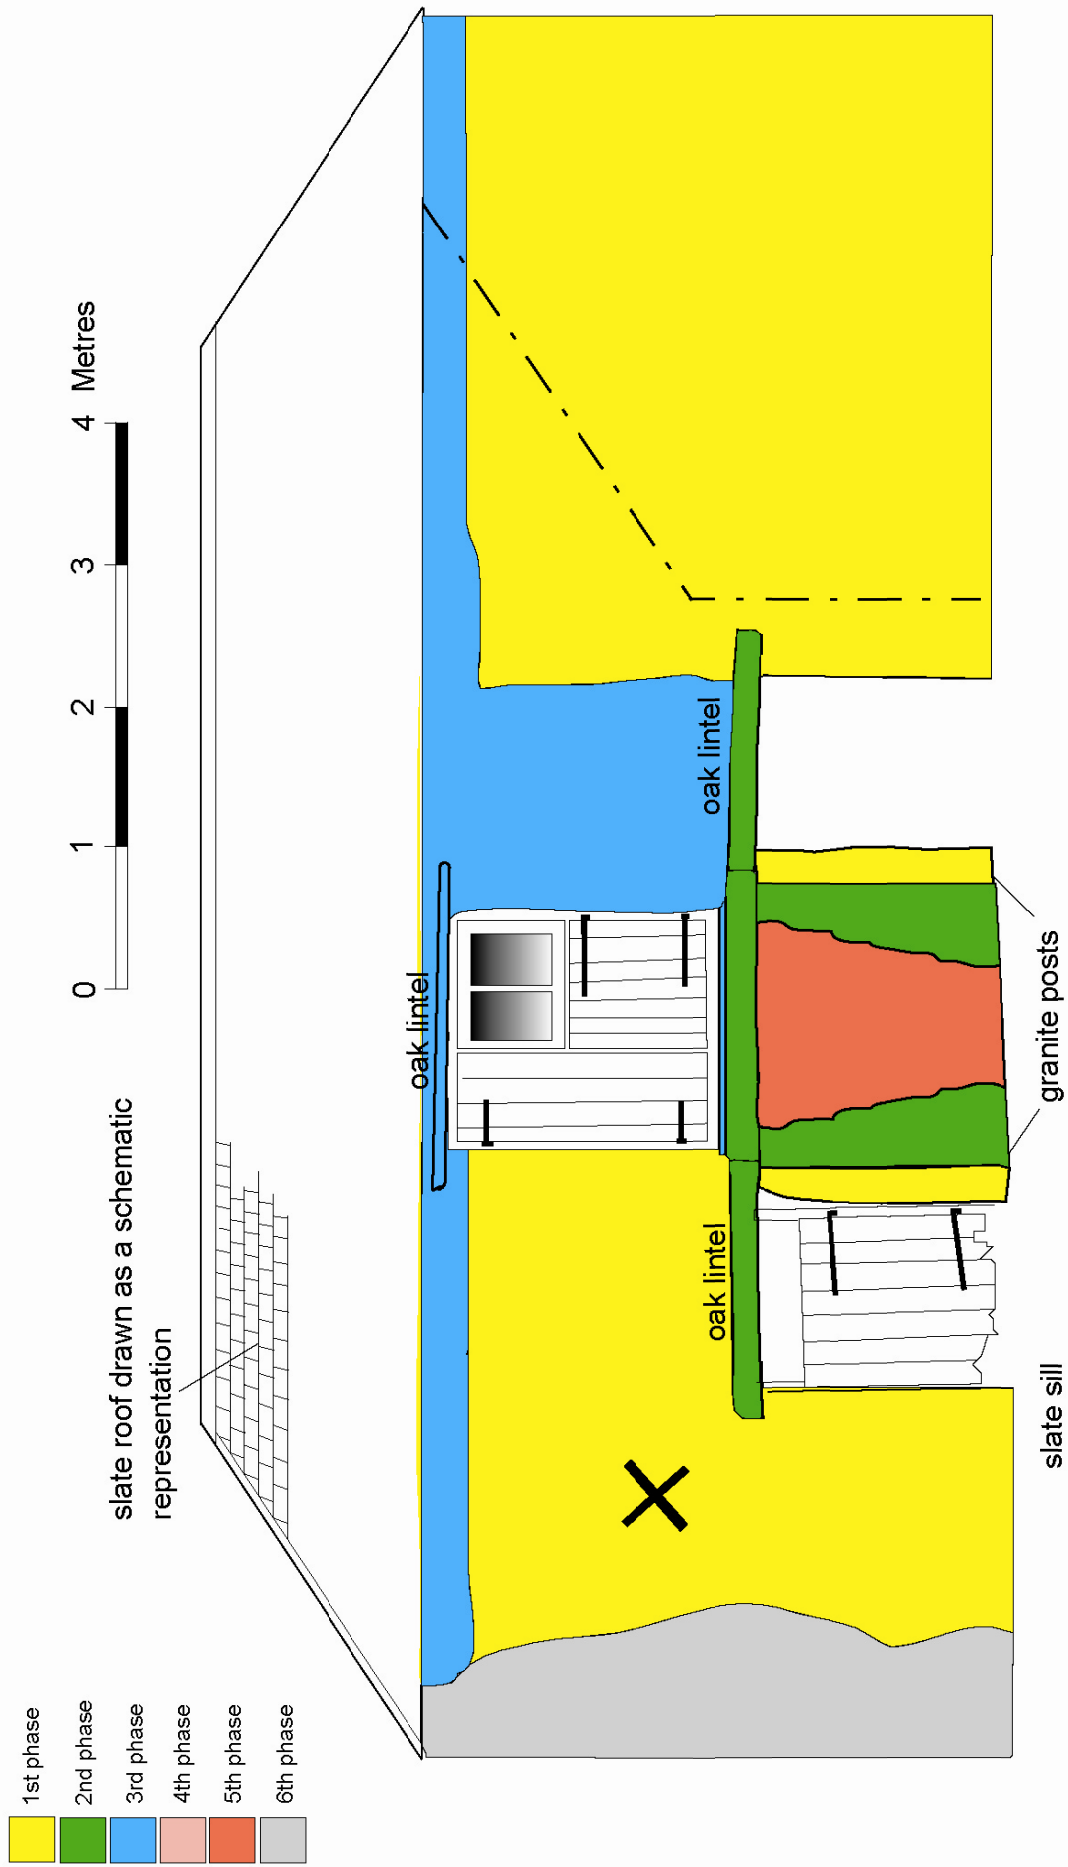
Phased drawing of the north elevation. Drawn to a scale of 1:50.
